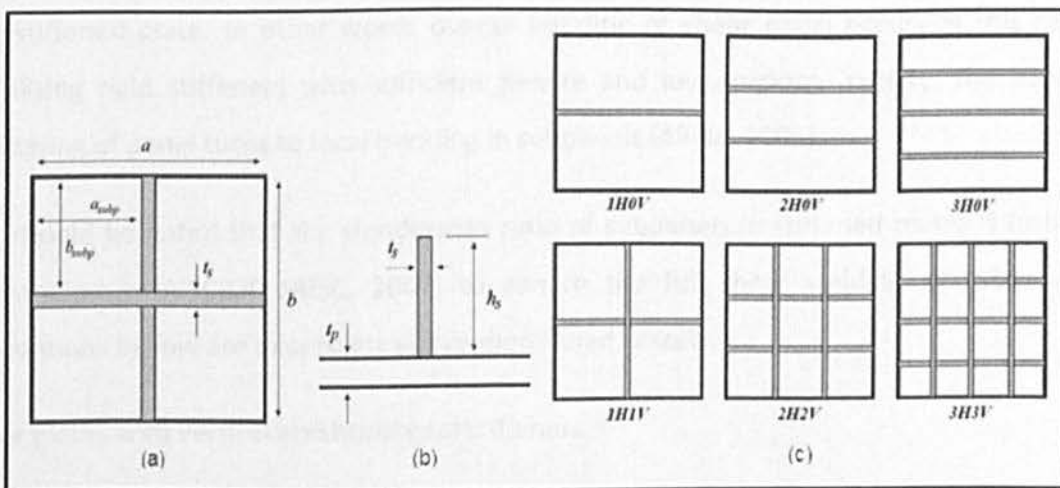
Scheme of geometrical specification of stiffened walls (a) Typical sub-plate dimensions, (b) Dimension of stiffeners (c) Various stiffener arrangements studied by Alinia and Sarraf (2009a)
